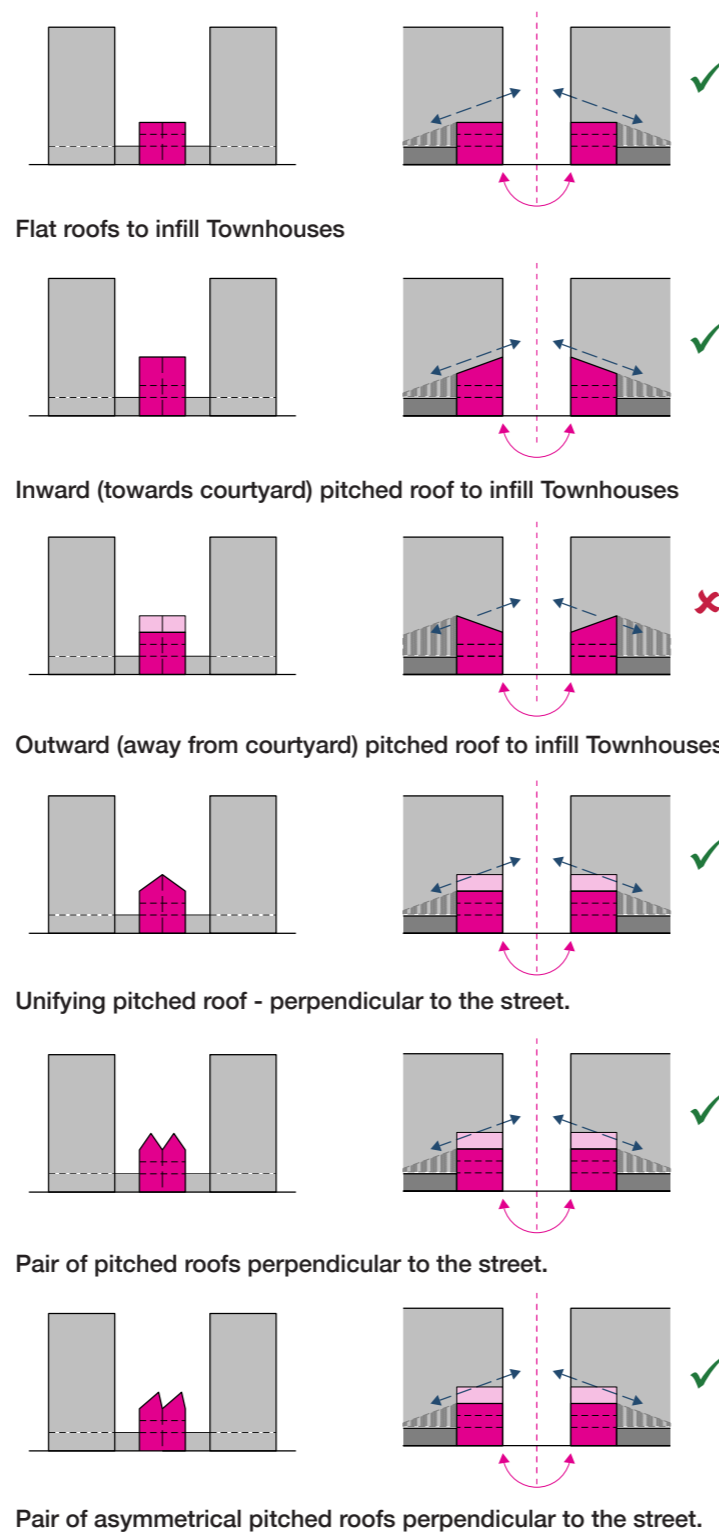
Section diagrams: roof expression of infill Townhouses.
